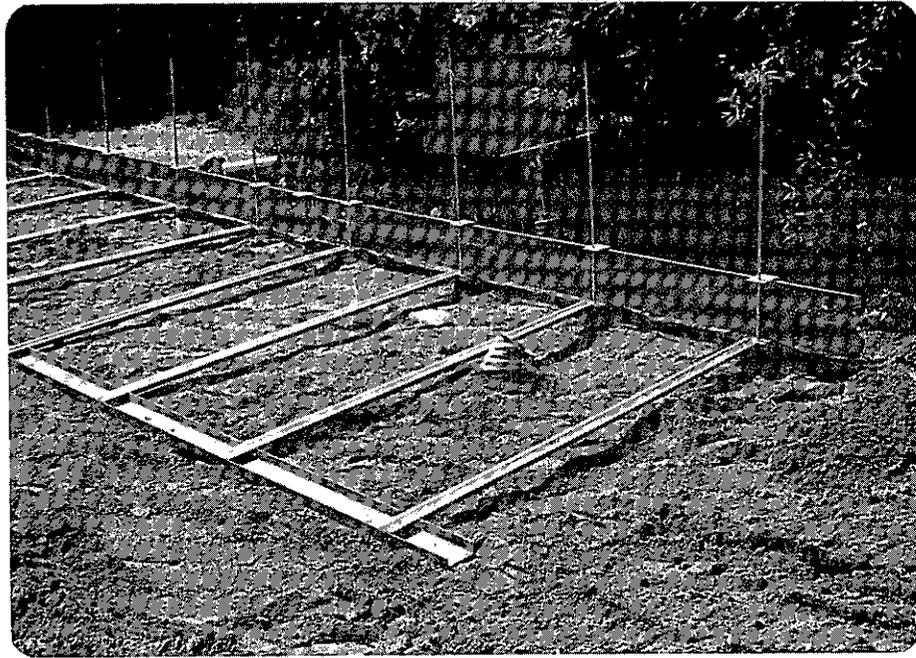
Assembled Guardrail Wall Facing, Sign Post Tieback, and Salvaged Rubbing Rail Anchor Ready for Burial with Backfill Material
